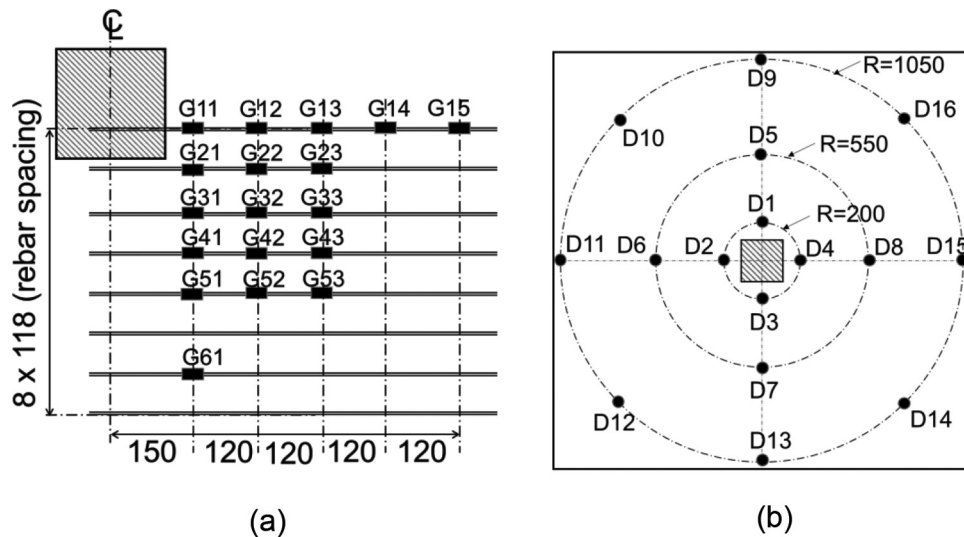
(a) Typical arrangement of steel strain gauges; and (b) typical locations of LVDTs.
